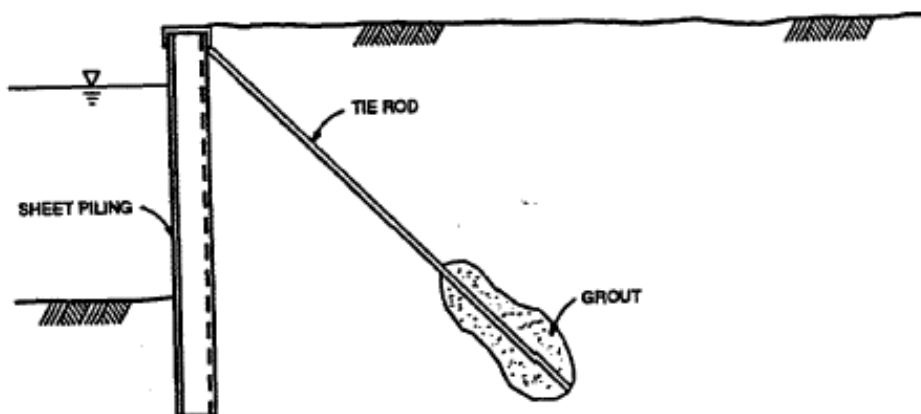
General procedures for anchor installation for support of a sheet pile wall (website of Atlantic Sheet Pile, Inc.)
